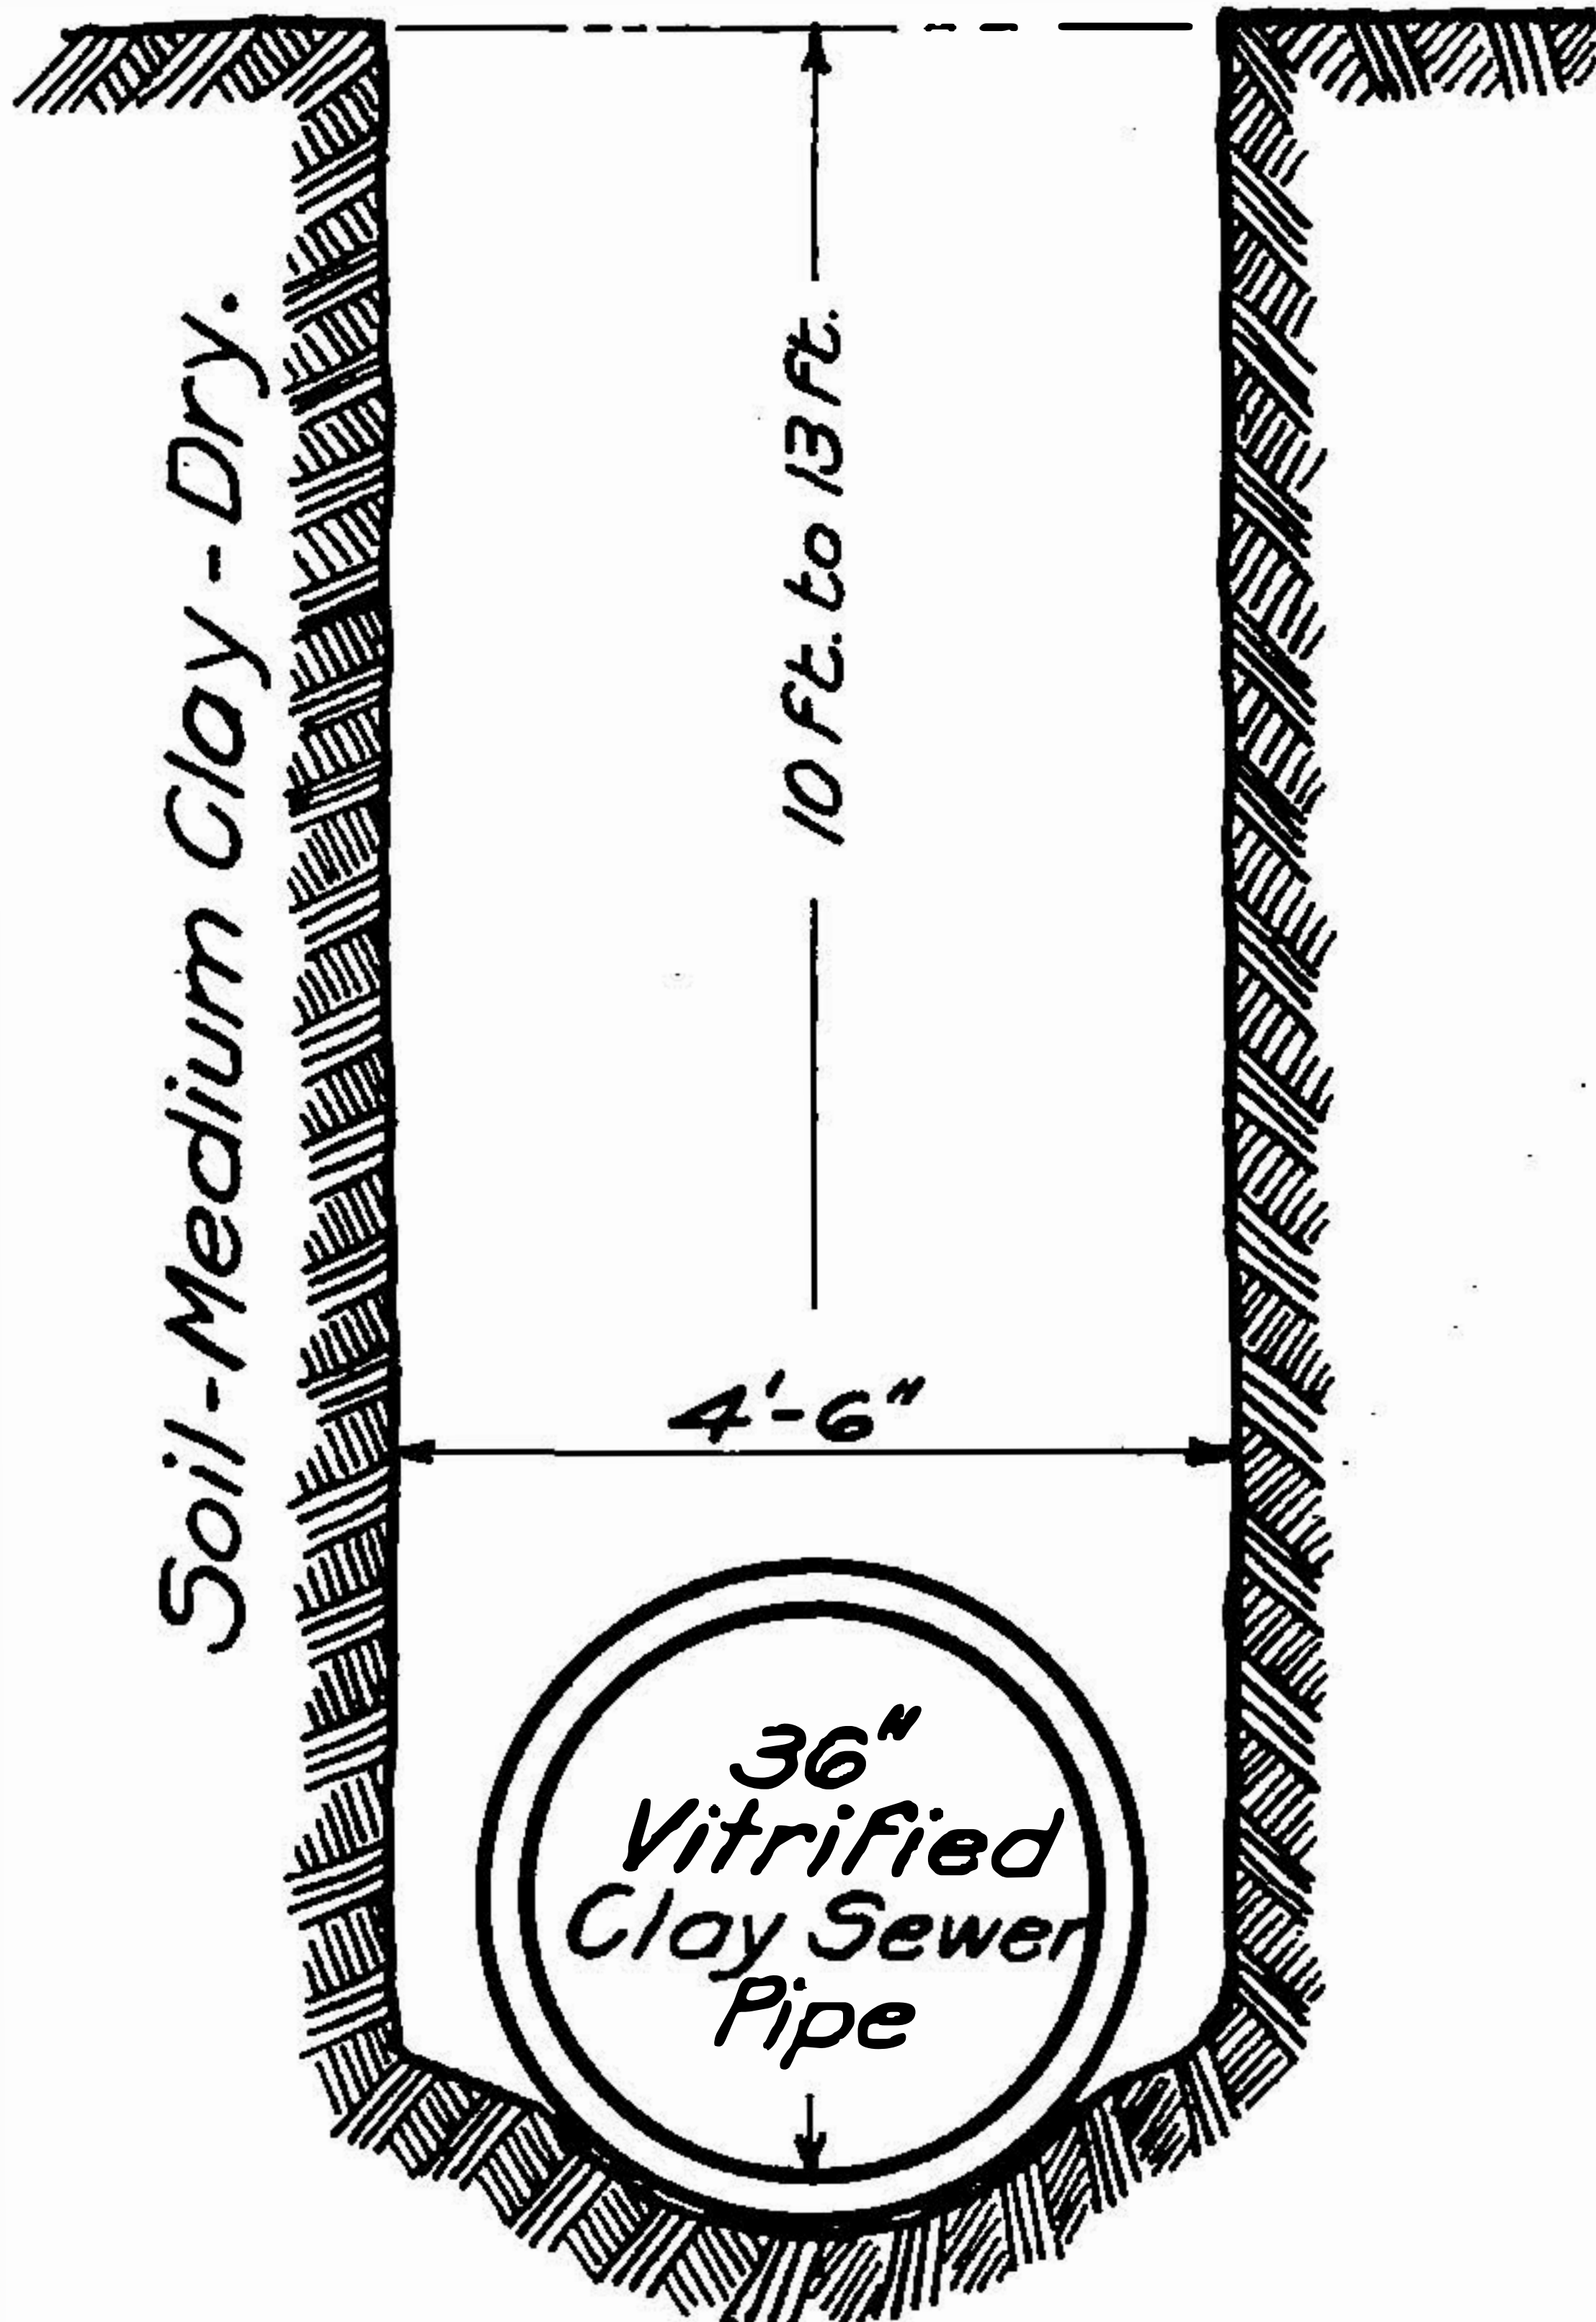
Cracking of 36 Inch Vitrified Clay Sewer Pipe in Ash Street Sewer, Clinton, Iowa.
